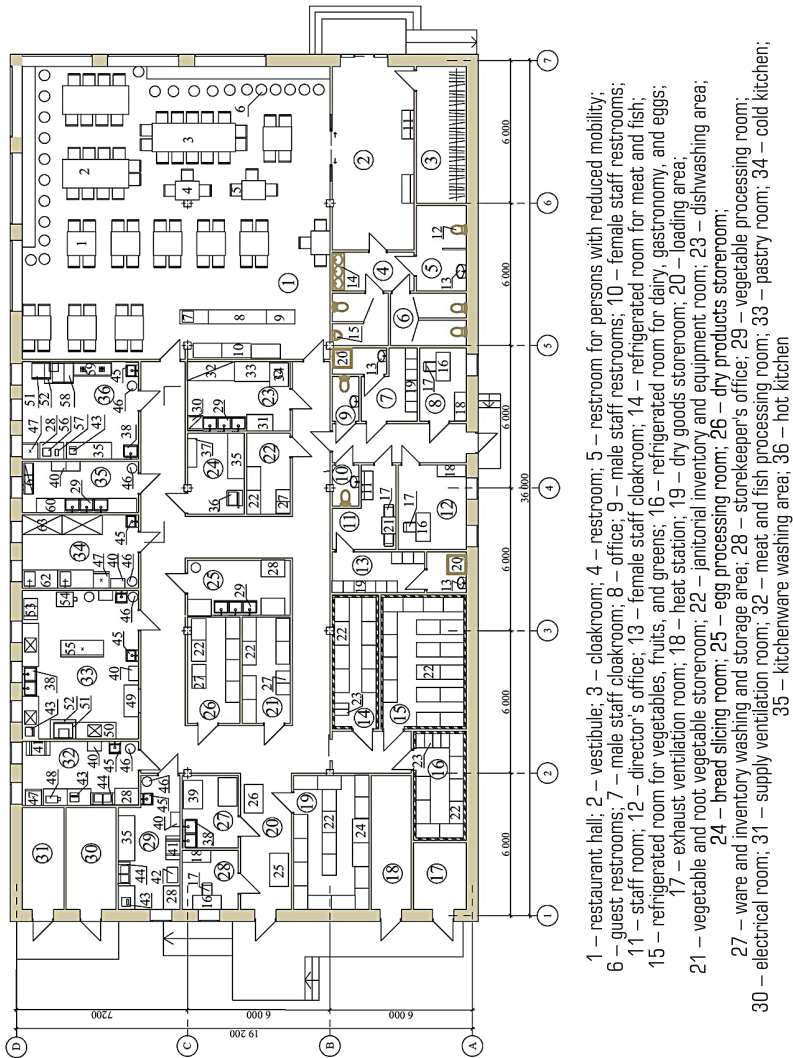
Floor plan at elevation 0.000 of a foodservice enterprise
